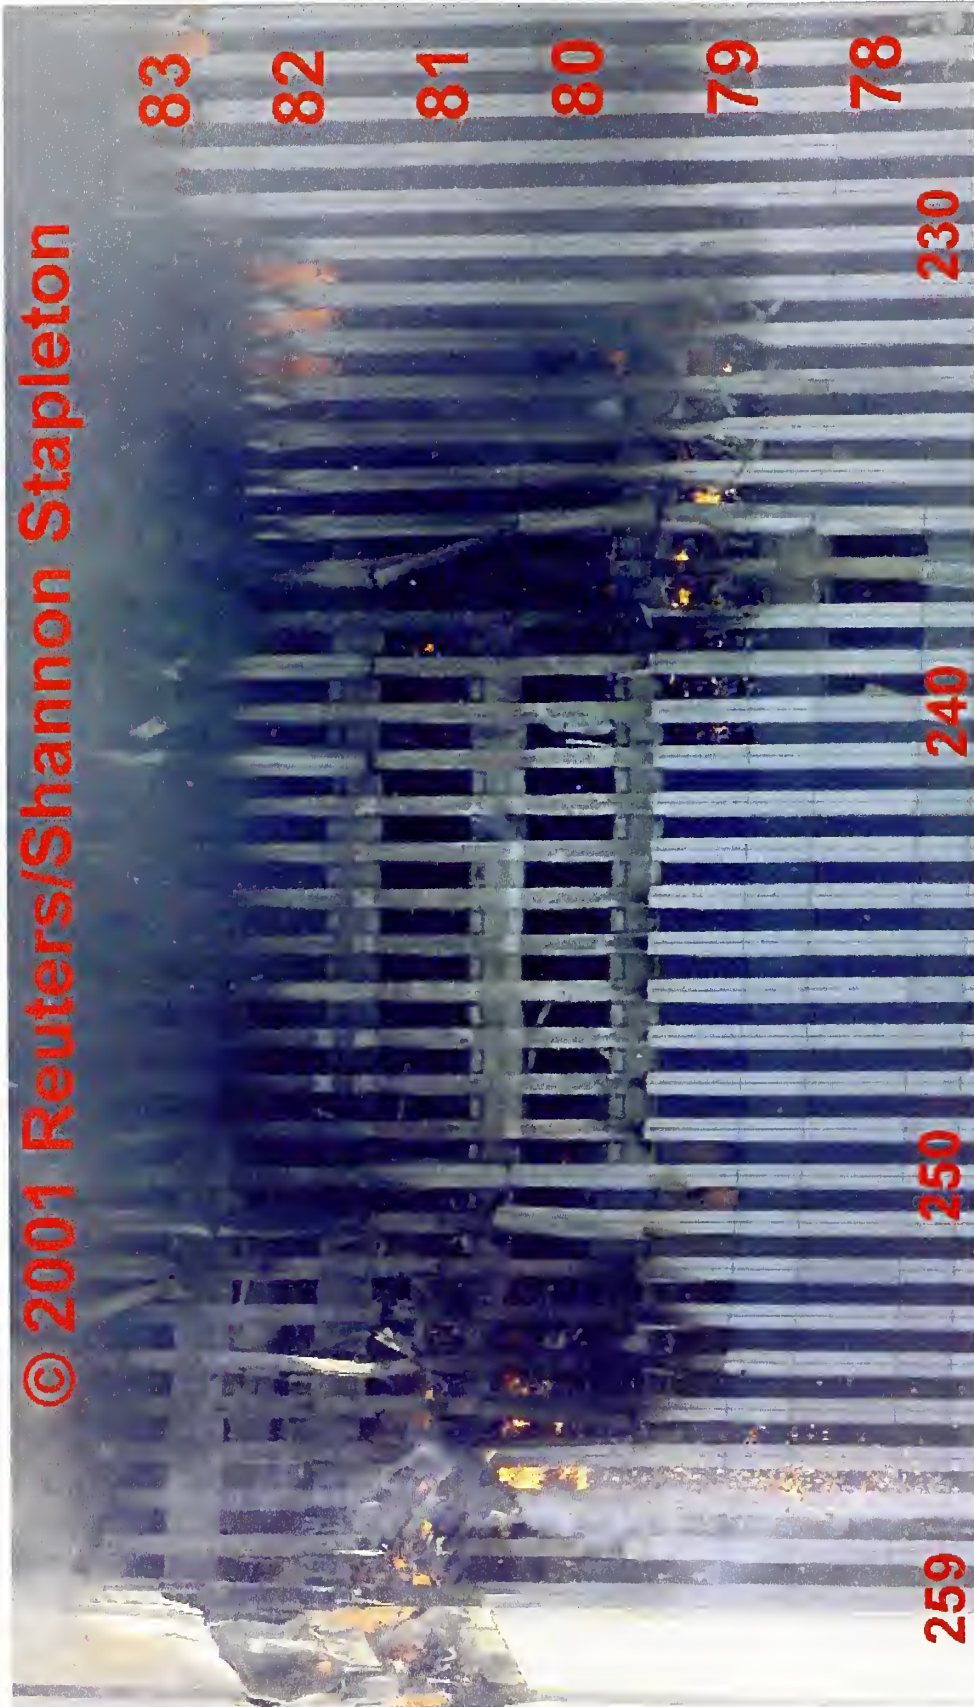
An enhanced photograph of the north face of WTC 2 taken at 9:58 a.m. shows the east side of the north face. Piles of debris are evident on floor 80 and floor 81 on the northeast corner and on floor 79 to the right of column 230. The "cold" area extends over floor 80 to floor 82 from roughly column 229 to 240. There is a break in column 253 on floor 81, and the adjacent column, 254, is bent. Floors 80, 81, and 82 appear to be partially collapsed. It appears as if the collapsed floor 83 in the northeast corner has broken into sections.
